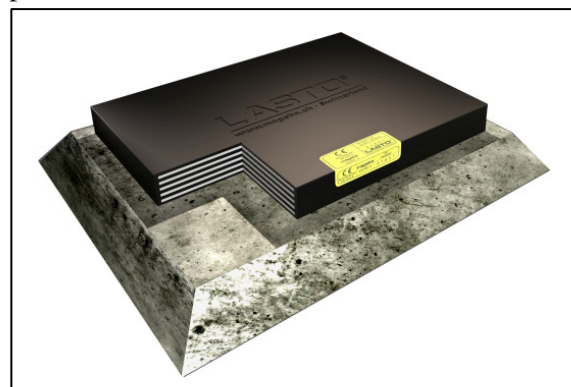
Schematic picture of an elastomeric bearing (without steel anchor plates above and below) with one corner cut away
